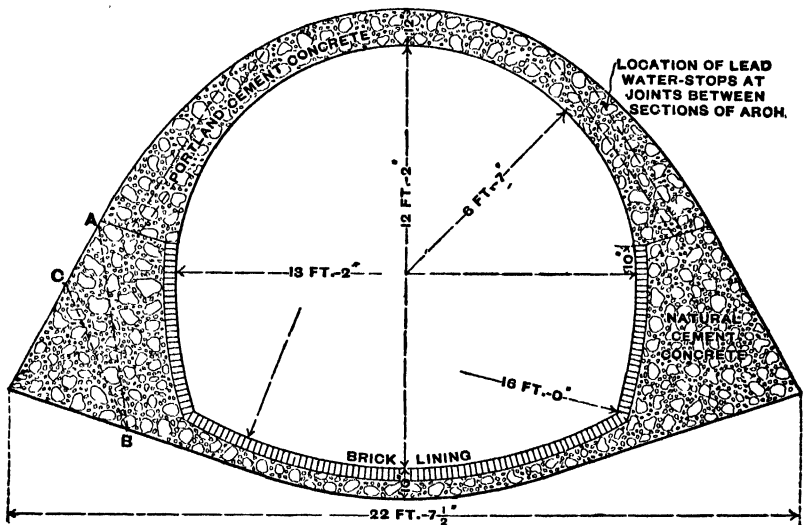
Typical Section of Weston Aqueduct in Loose Earth. (See p. 783.)
